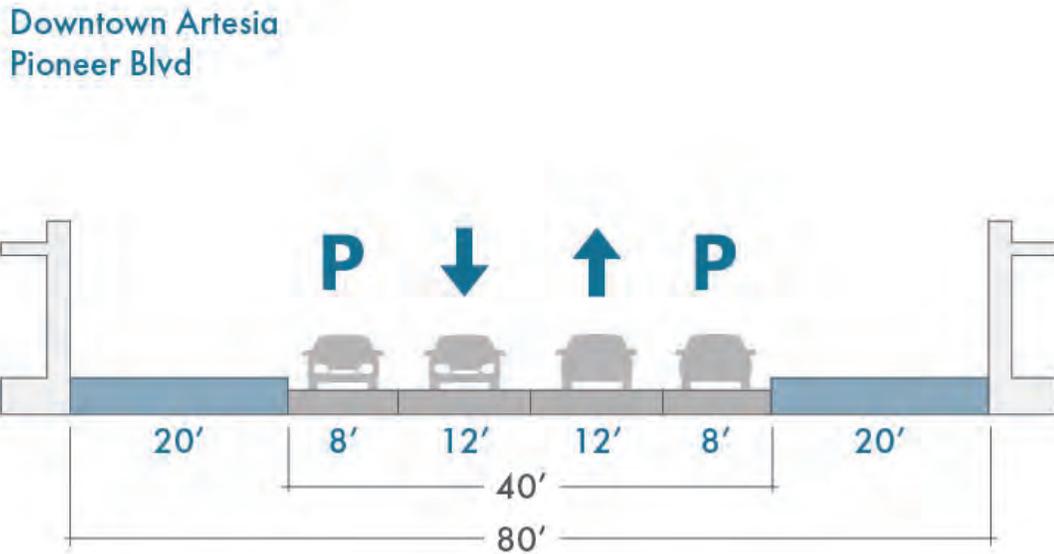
Pioneer Boulevard (186th to 187th) Existing Street Section
